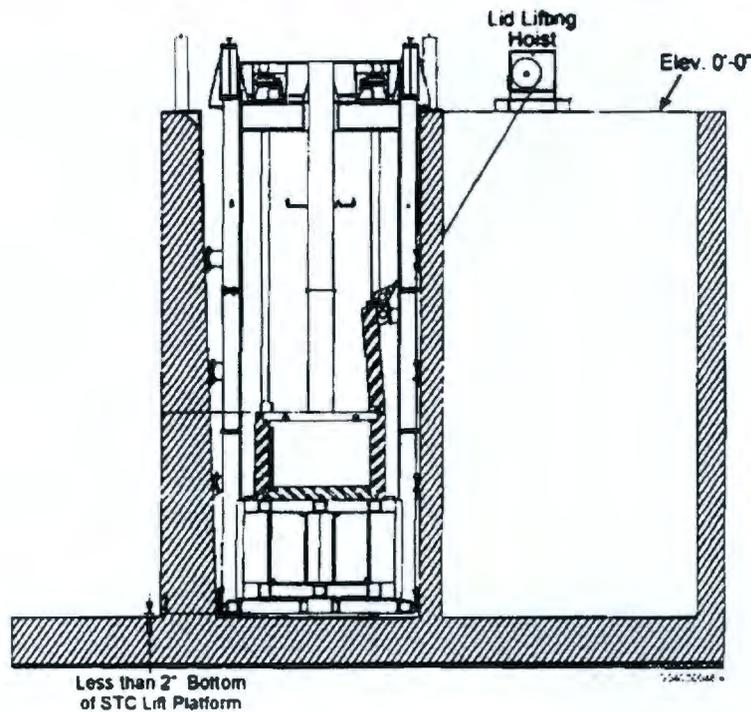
Shielded Transfer Cask Lift Platform Elevation View
